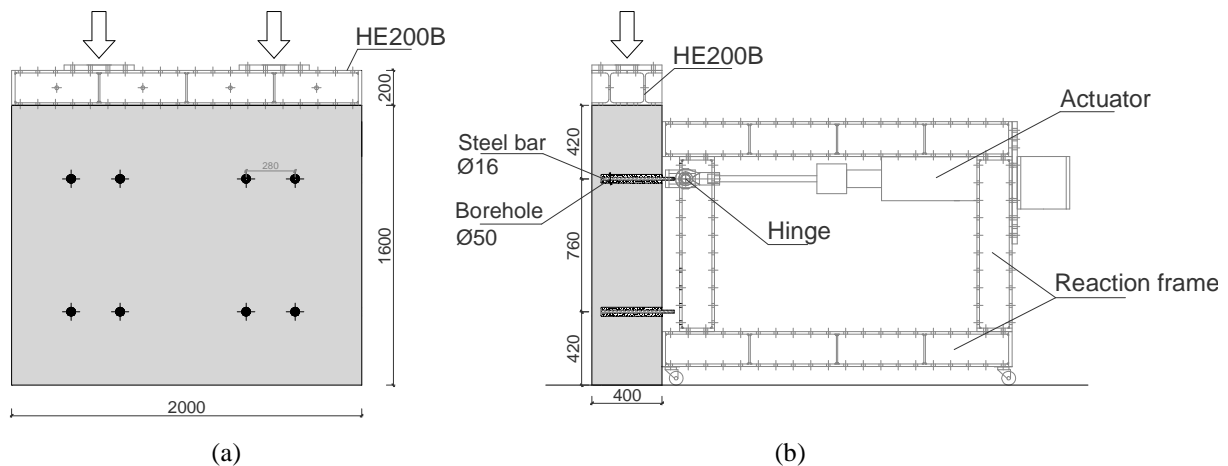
Specimen configuration (in millimetres): (a) Front view with location of anchors; (b) Cross section of wall and test set-up.
